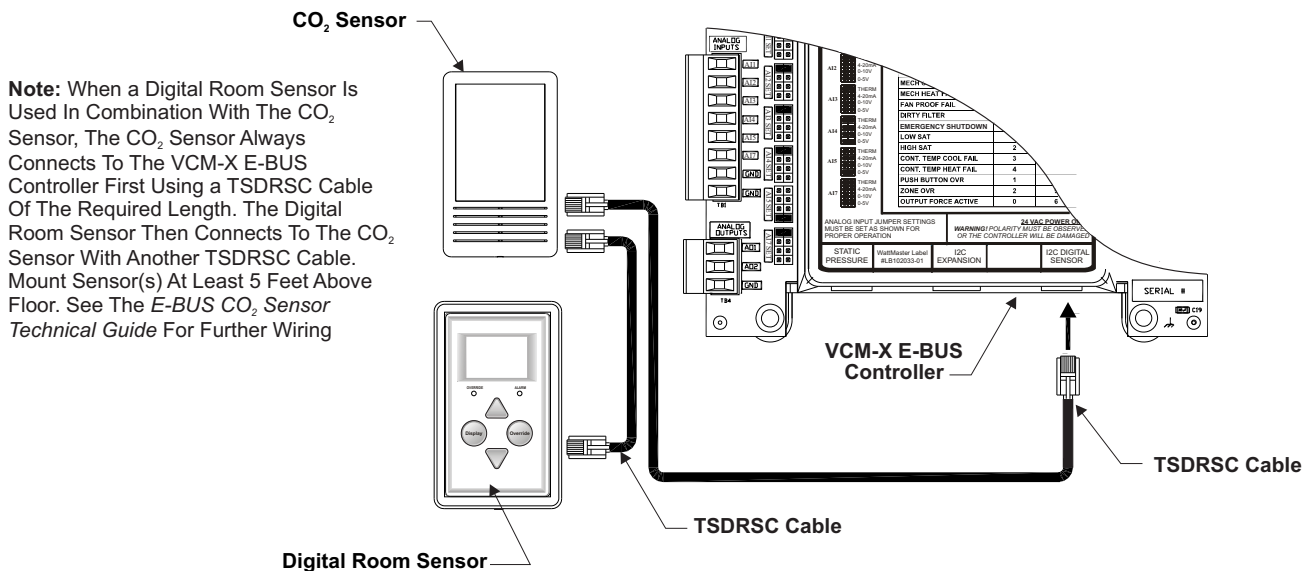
OE256-01 – Wall Mounted Space CO₂ Sensor Wiring
